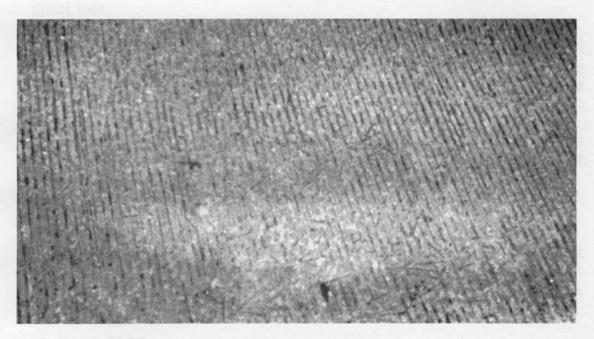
Loop 610 after overlay. This is the surface of a section using steel fiber reinforcement.
